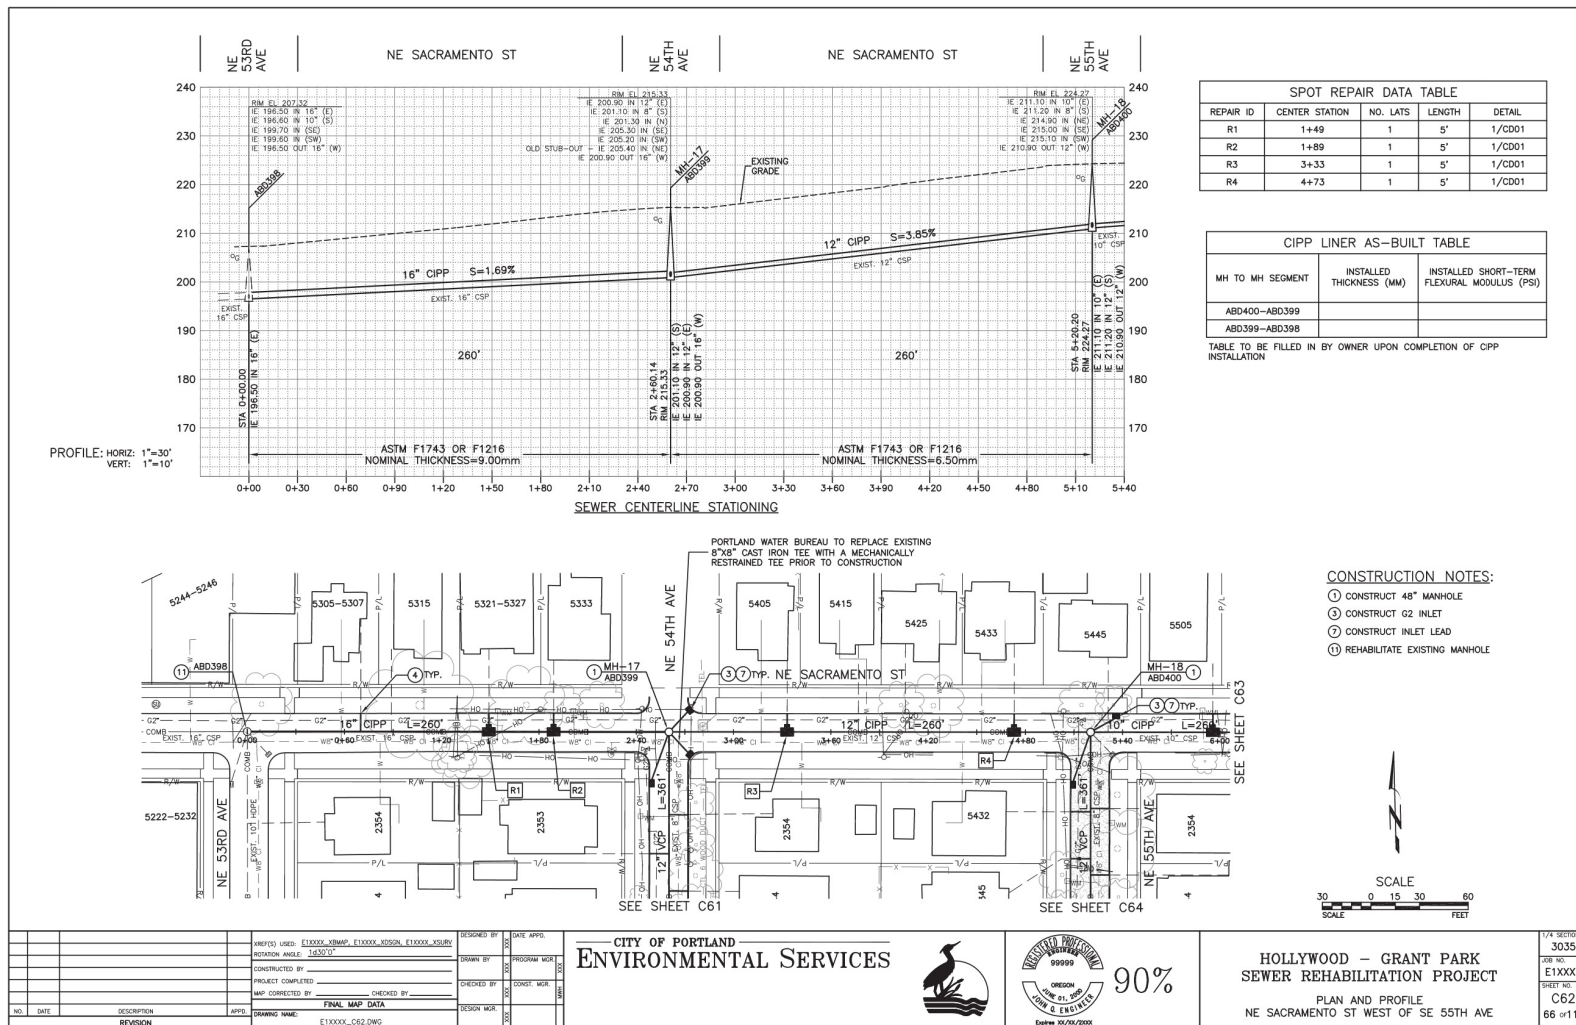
A sewer rehabilitation plan and profile used to document sewer line construction.
